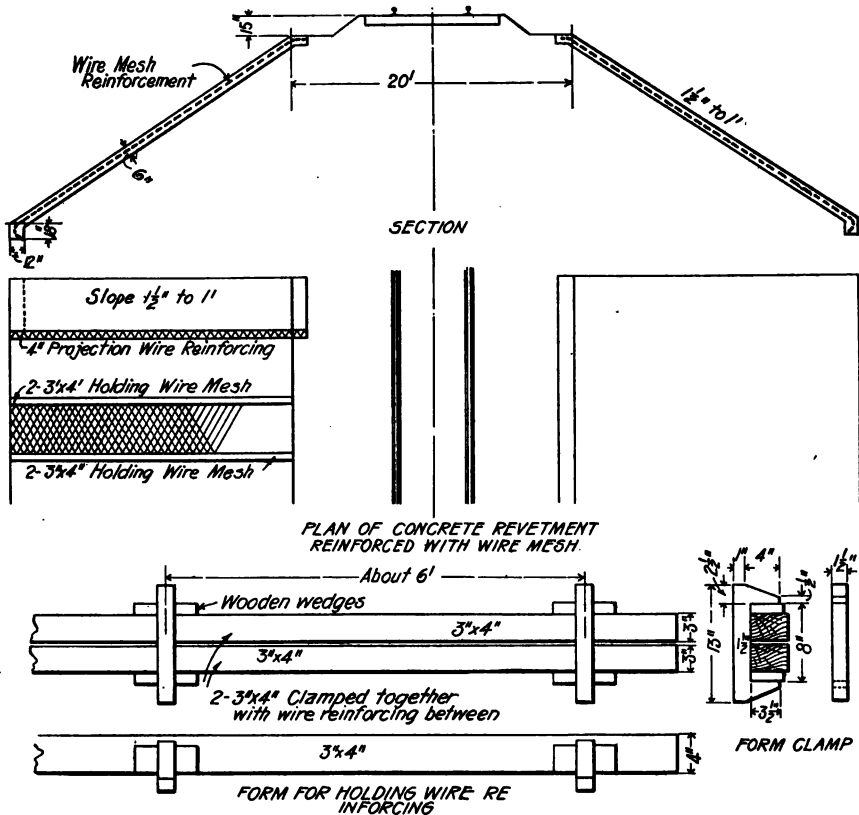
Reinforced Concrete Slab Bank Protection, Southern Pacific Co.
